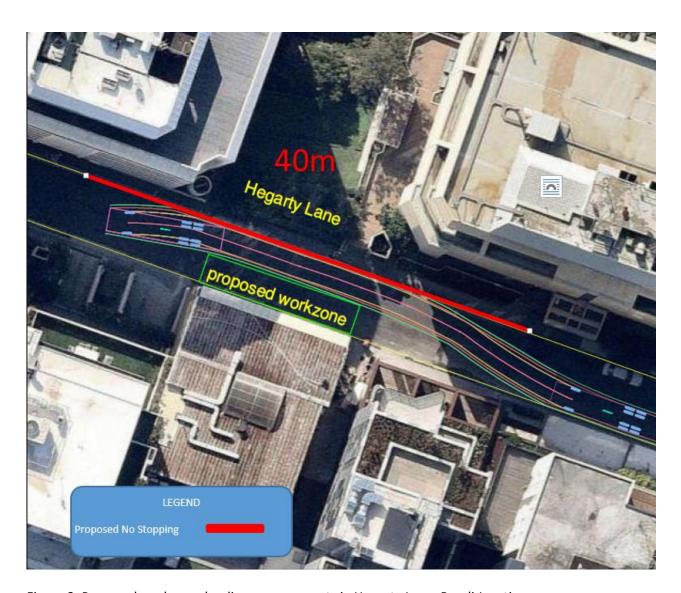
Proposed work zone loading arrangements in Hegarty Lane, Bondi Junction.
